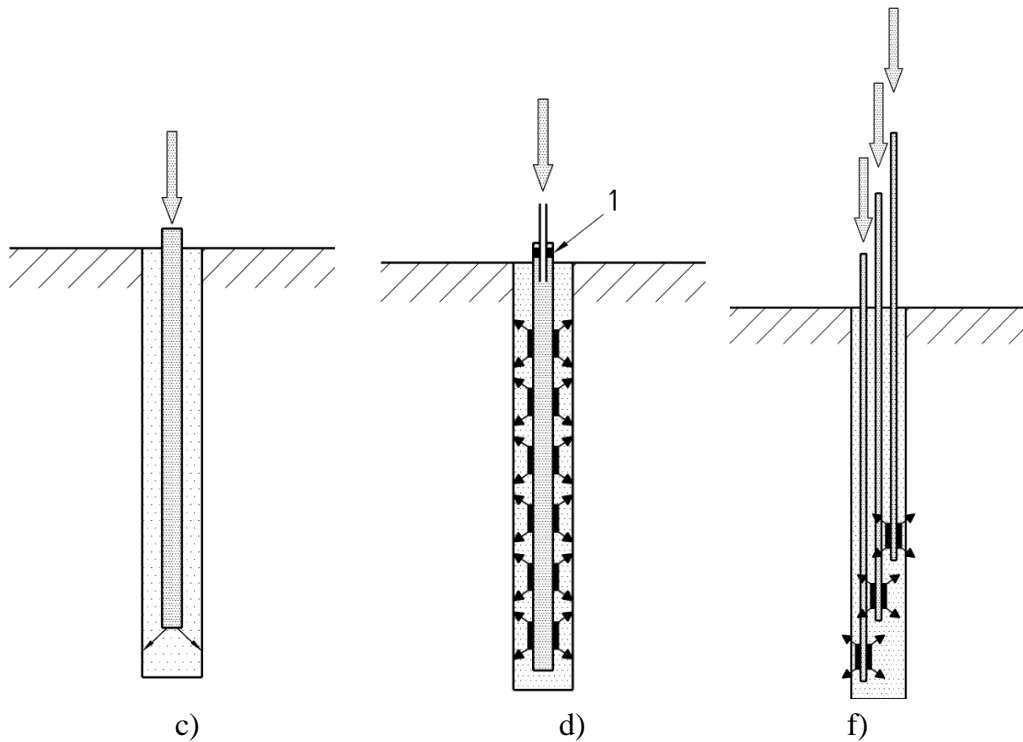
c): Single-step grouting through a load-bearing element, d) Single-step grouting through a tube-à-manchettes, f) Single-step grouting through several post-grouting tubes [EN-14199]
